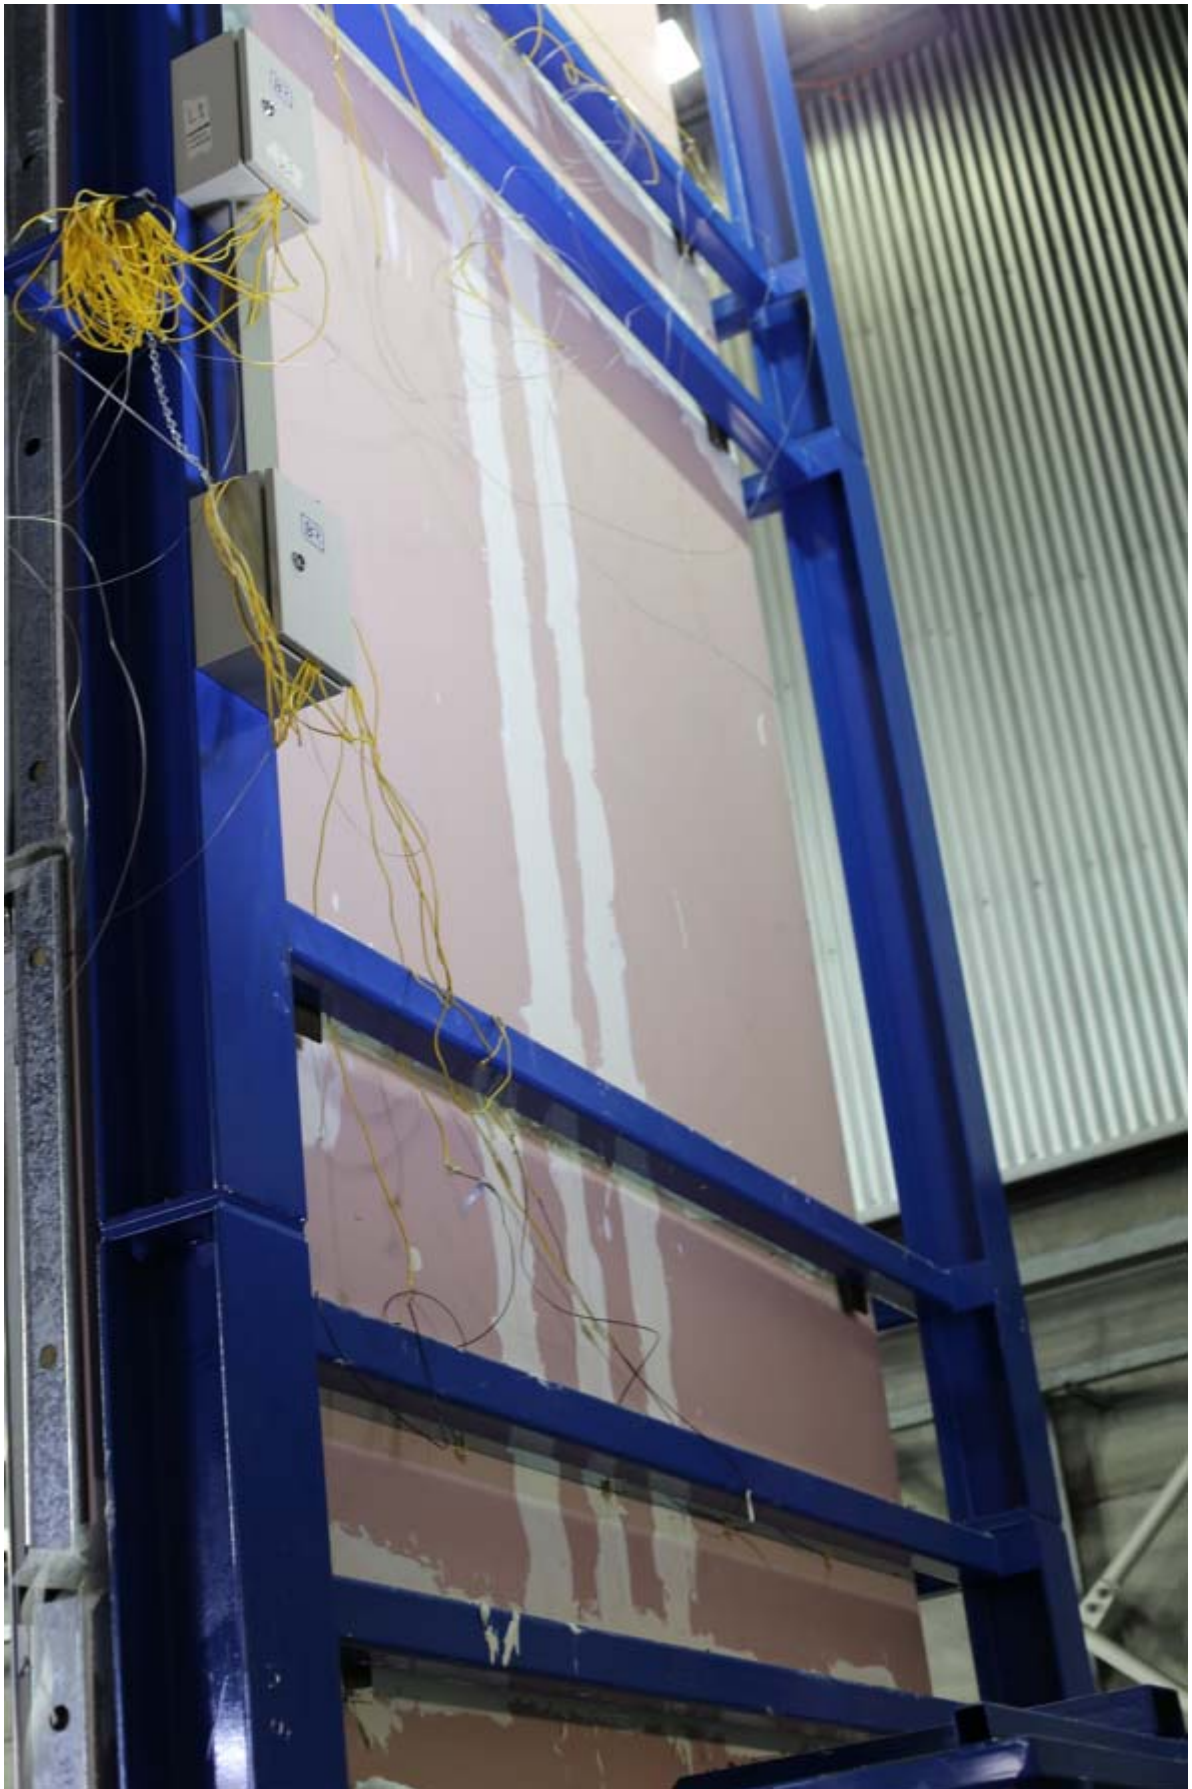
Undamaged state of the unexposed side of plasterboard layer at the conclusion of testing
